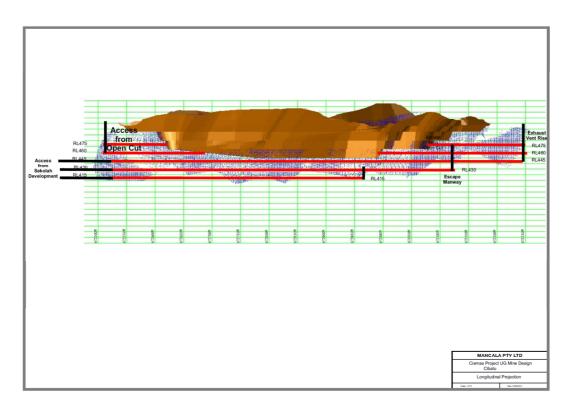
Longitudinal projection of conceptual mine design for Cibatu post open cut mining.
